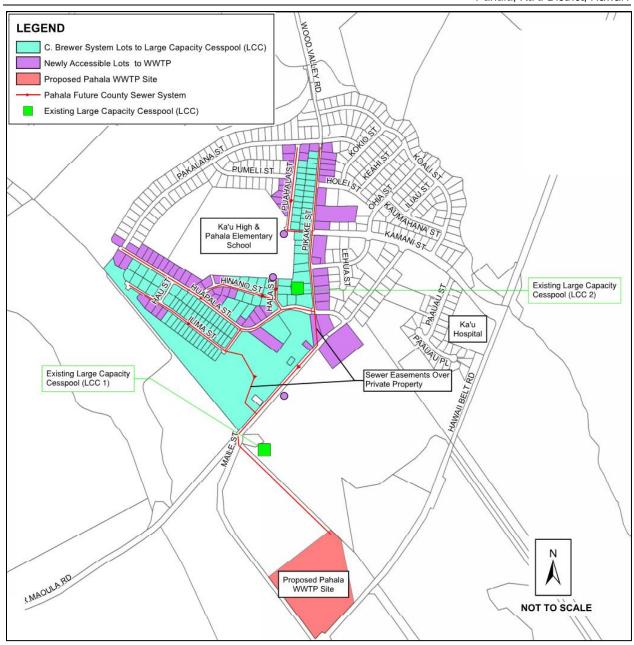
Preliminary Collection System Plan with New Wastewater Treatment and Disposal Facility at Site 7 (Preferred Alternative)
